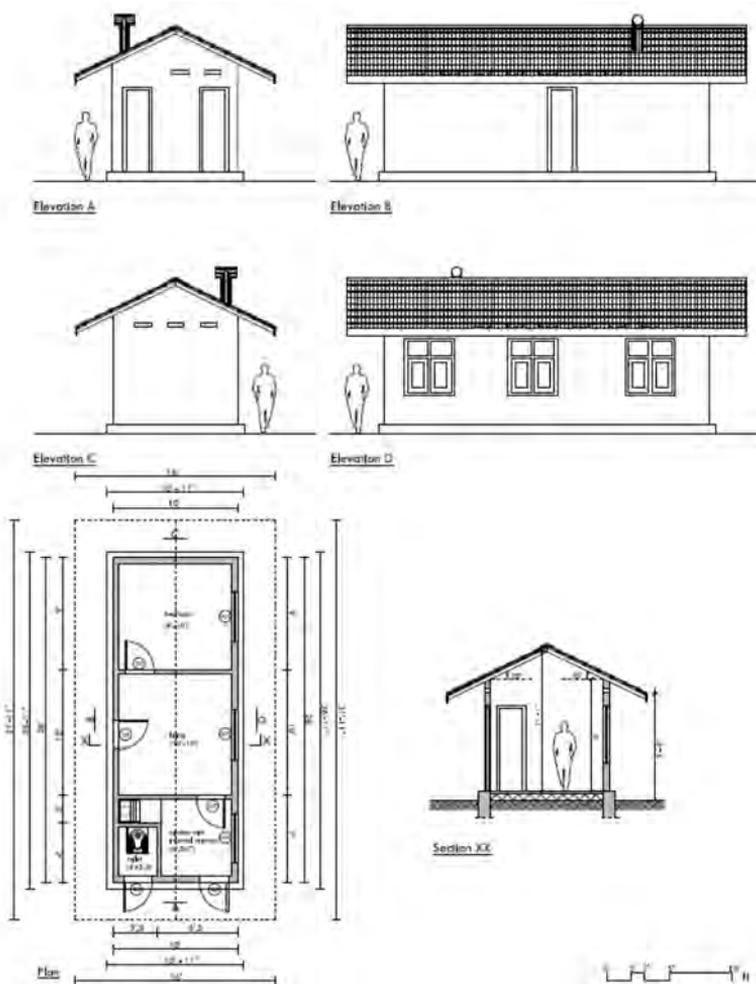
Proposed type 2 house 276 sq. ft. with separated rest area and kitchen – perspective, plan, section, elevations.
